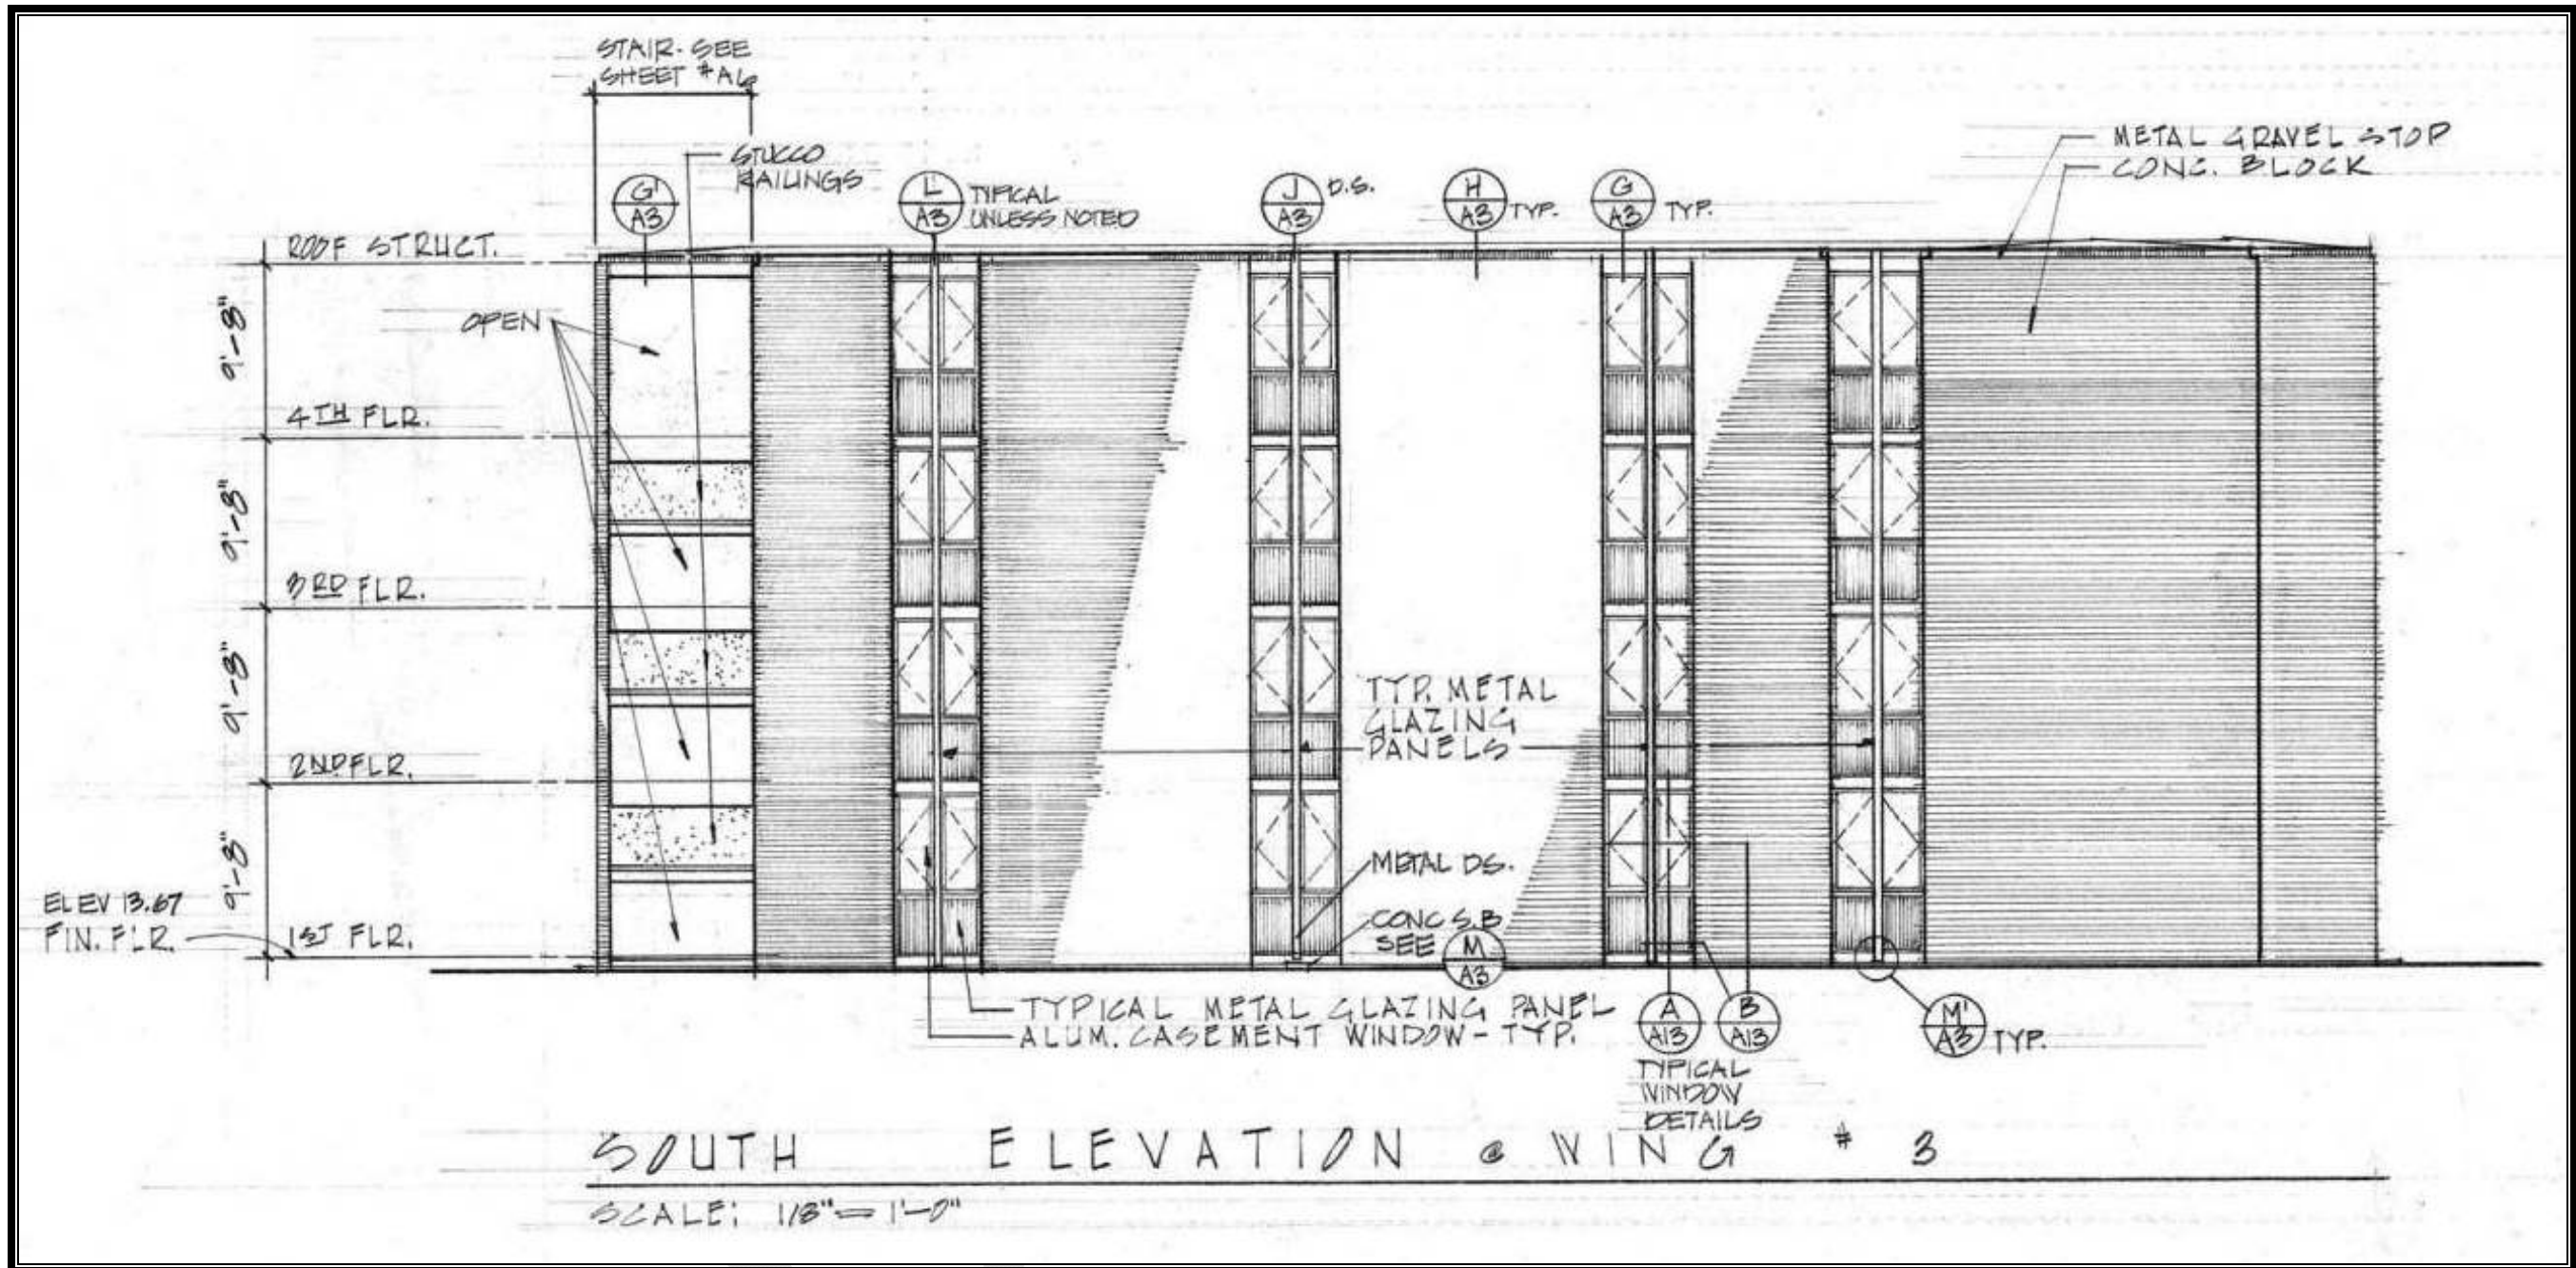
Buildings 778 thru 782, 1967 (Courtesy Naval Air Station North Island)
